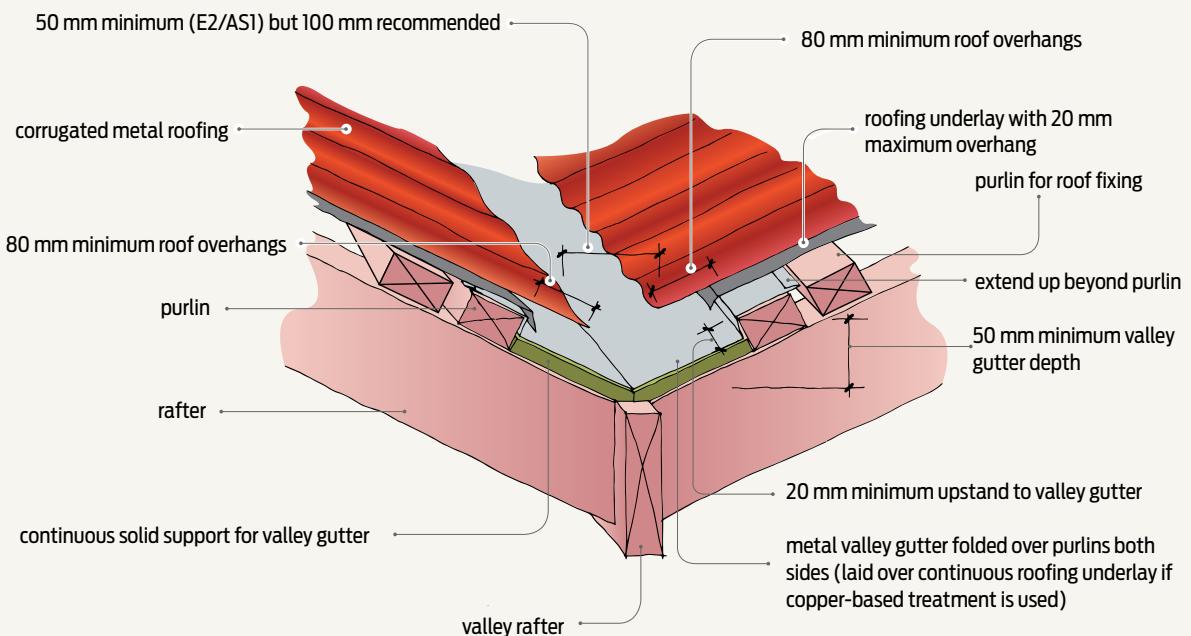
Section C – cross-section through alternative valley gutter detail to E2/AS1.
